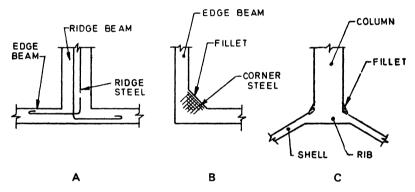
EXTRA PROVISIONS AT CRITICAL SECTIONS (ORIGINAL REINFORCEMENT NOT SHOWN)
